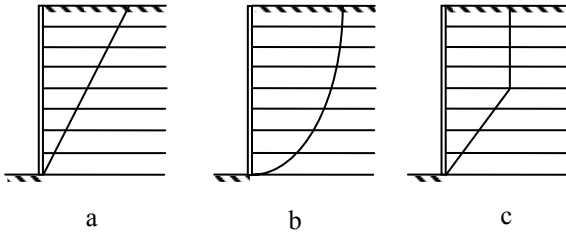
Mechanical models of overall failure of a reinforced earth wall: *a* - plane failure, *b* - circular failure, *c* - mixed failure
